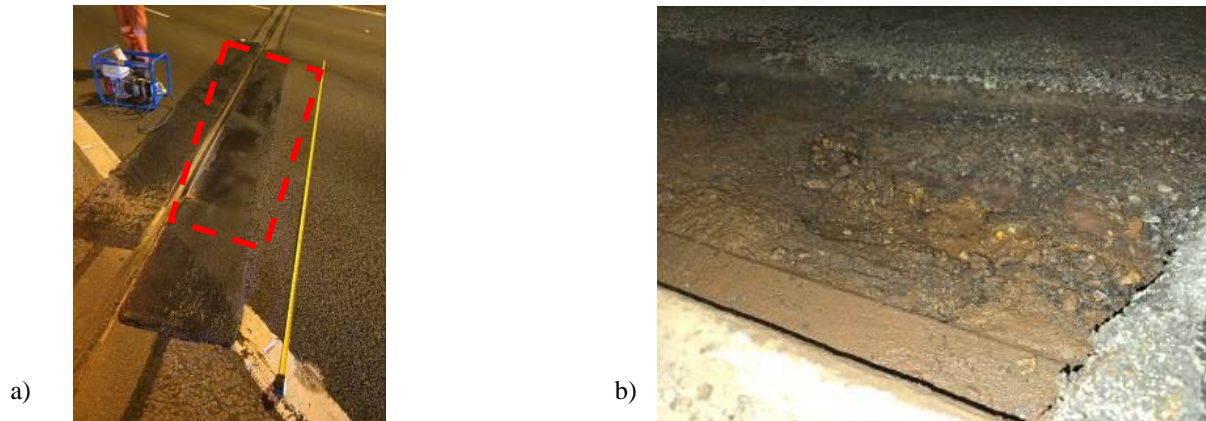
Case study of a bridge with failed expansion joint nosing, a. Photo of the failed temporary repair (highlighted in red box) before excavation, and b. Photo of the bridge deck after excavating expansion joint temporary repair.
